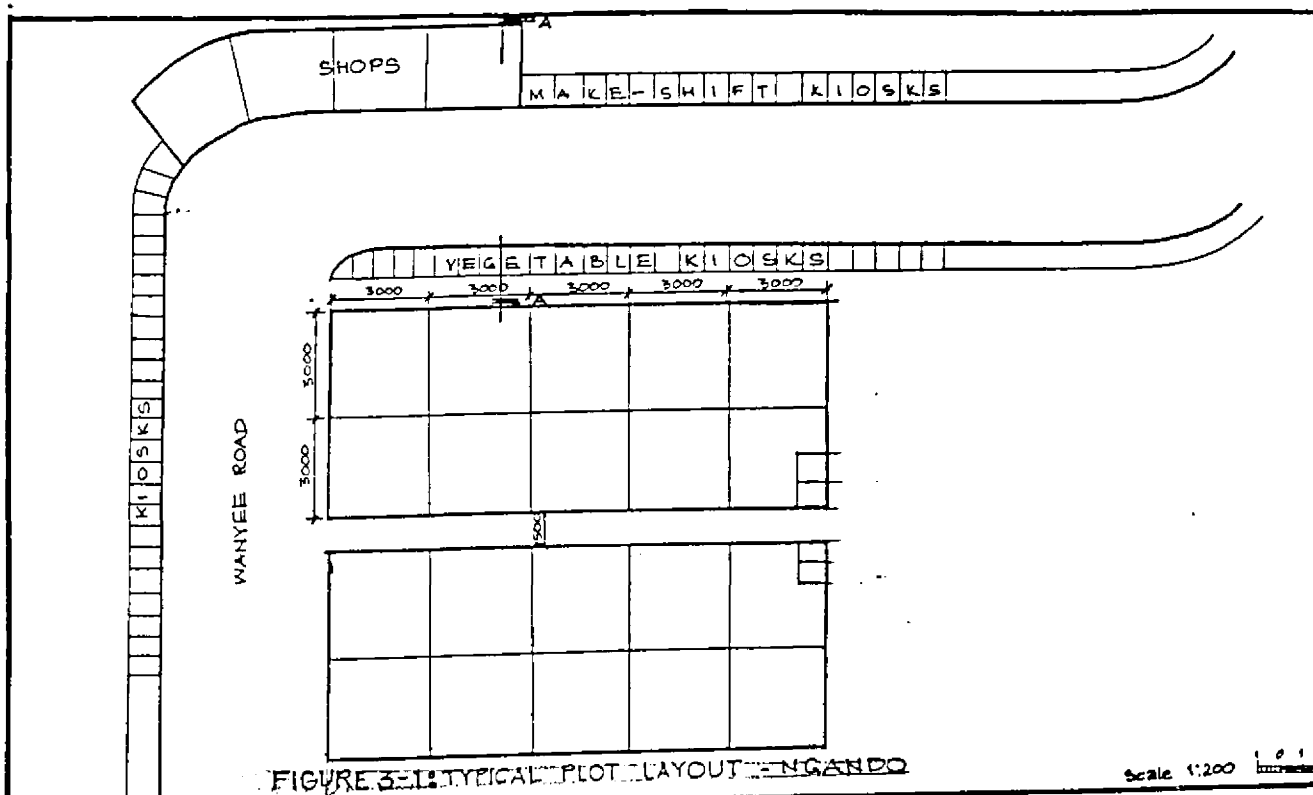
TYPICAL PLOT LAYOUT - NGANDO
